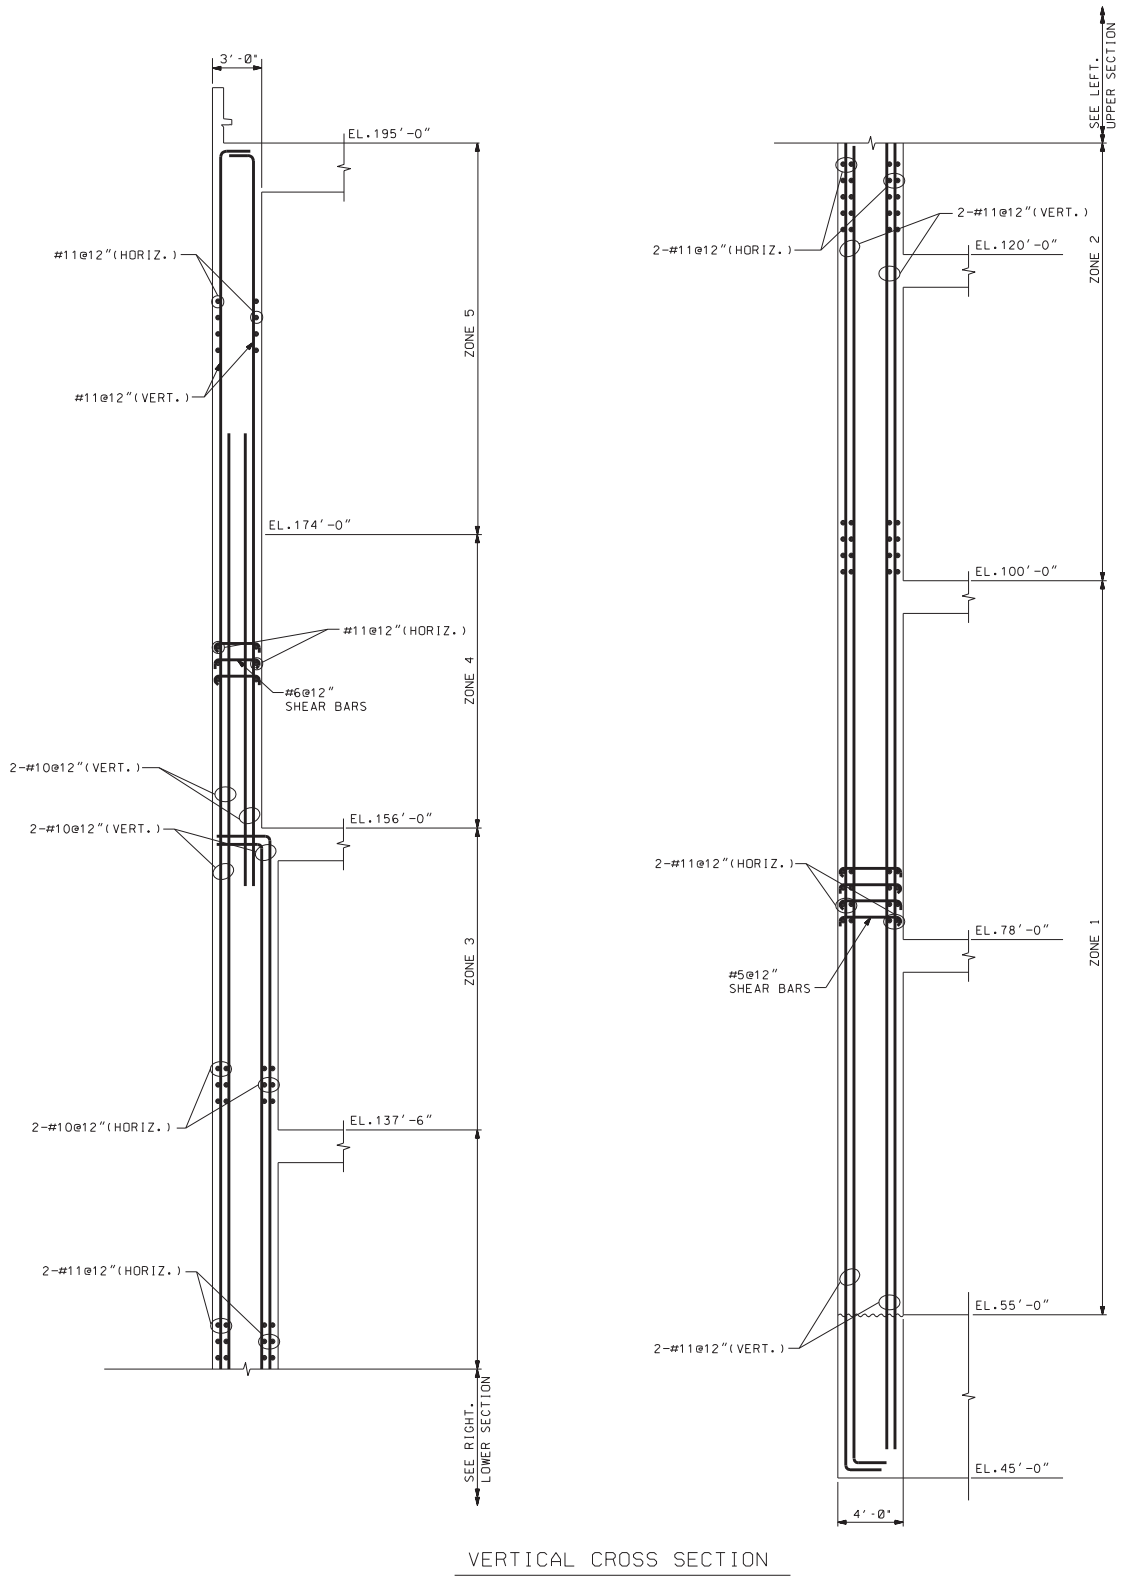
A-42 Reinforcement Arrangement of the AB AFWST Wall
